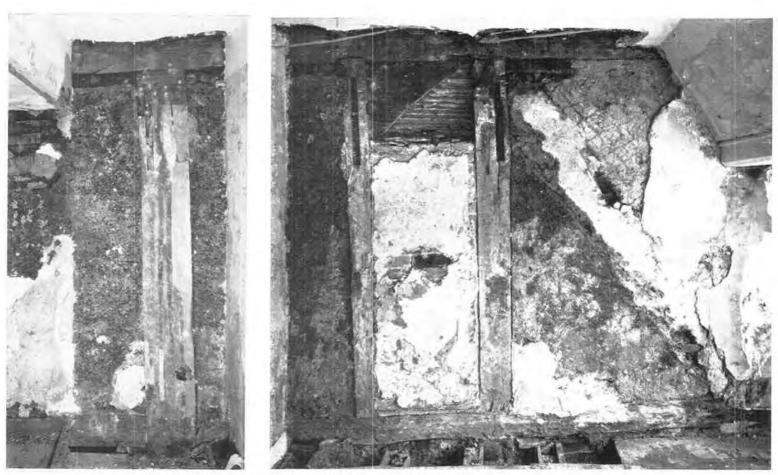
PLATE II (a) South wall of hall, first floor. (a) Left of chimney (b) Right of chimney.
